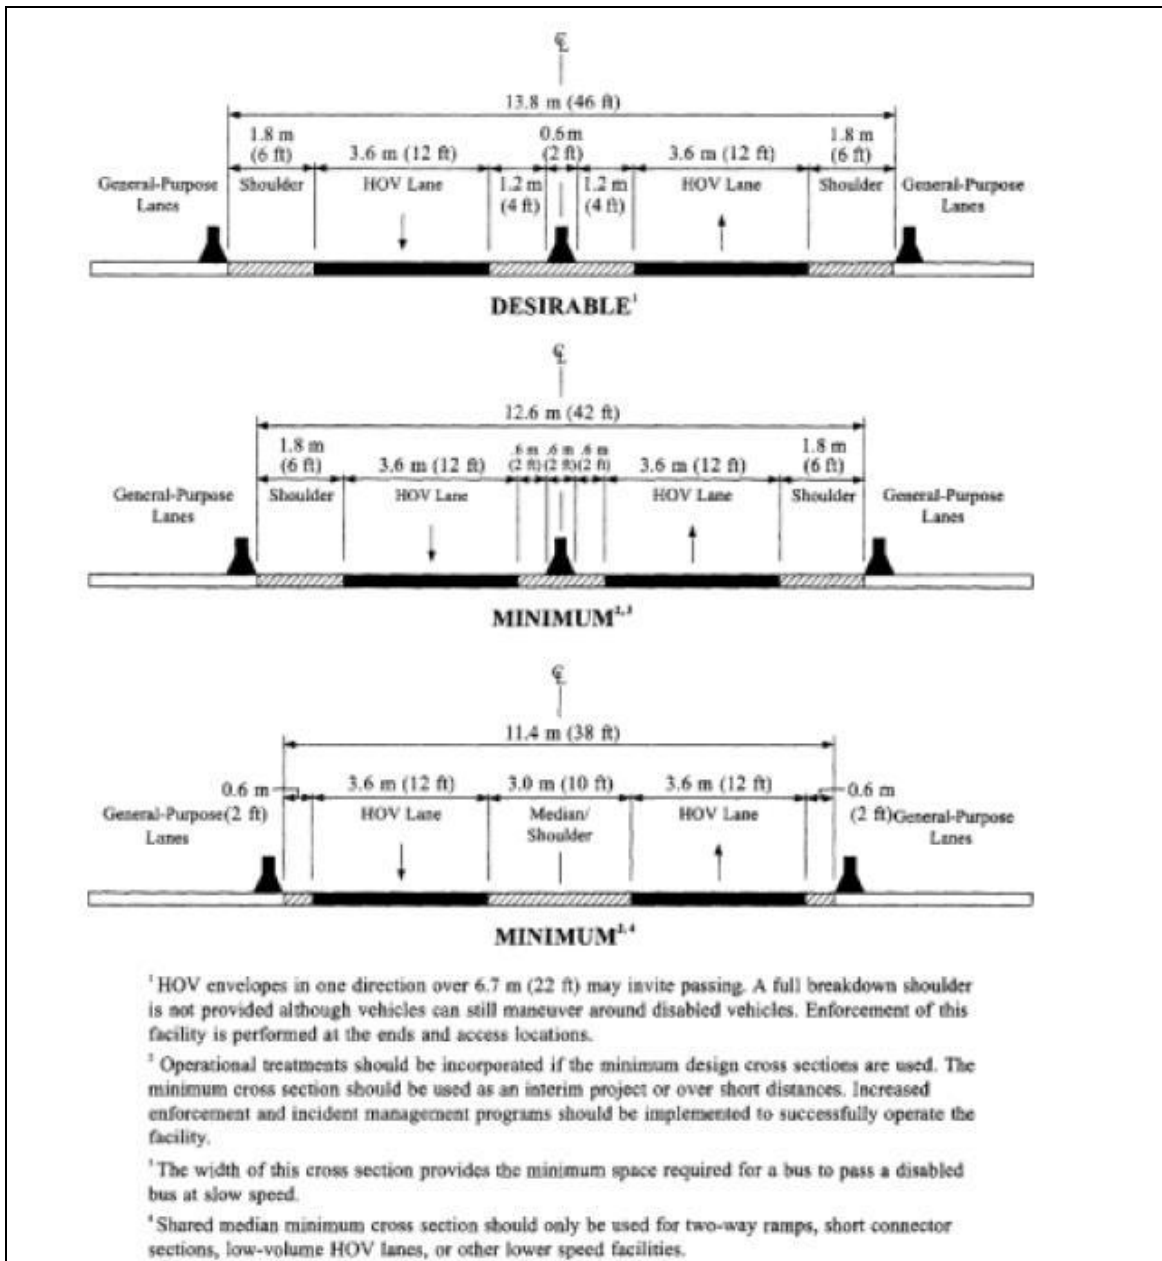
Example of Cross Sections for Barrier-Separated Two Way HOV Facilities
